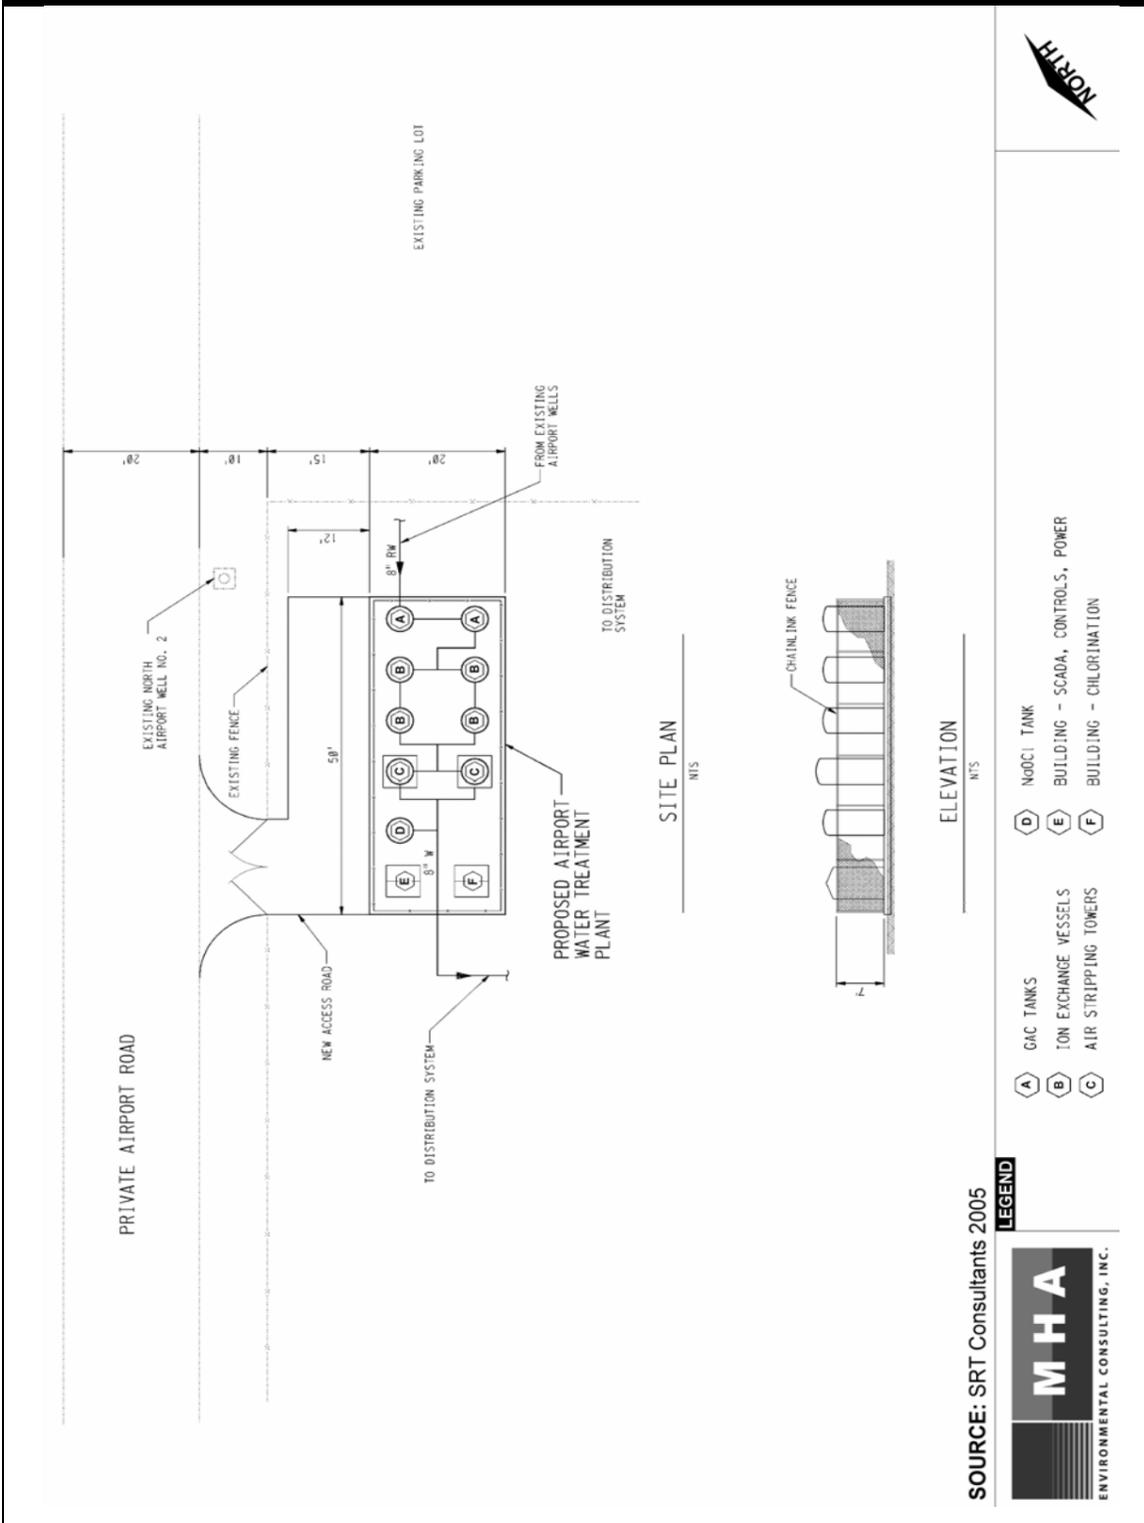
Airport Wells Proposed Water Treatment Plant Site Plan and Cross Section
